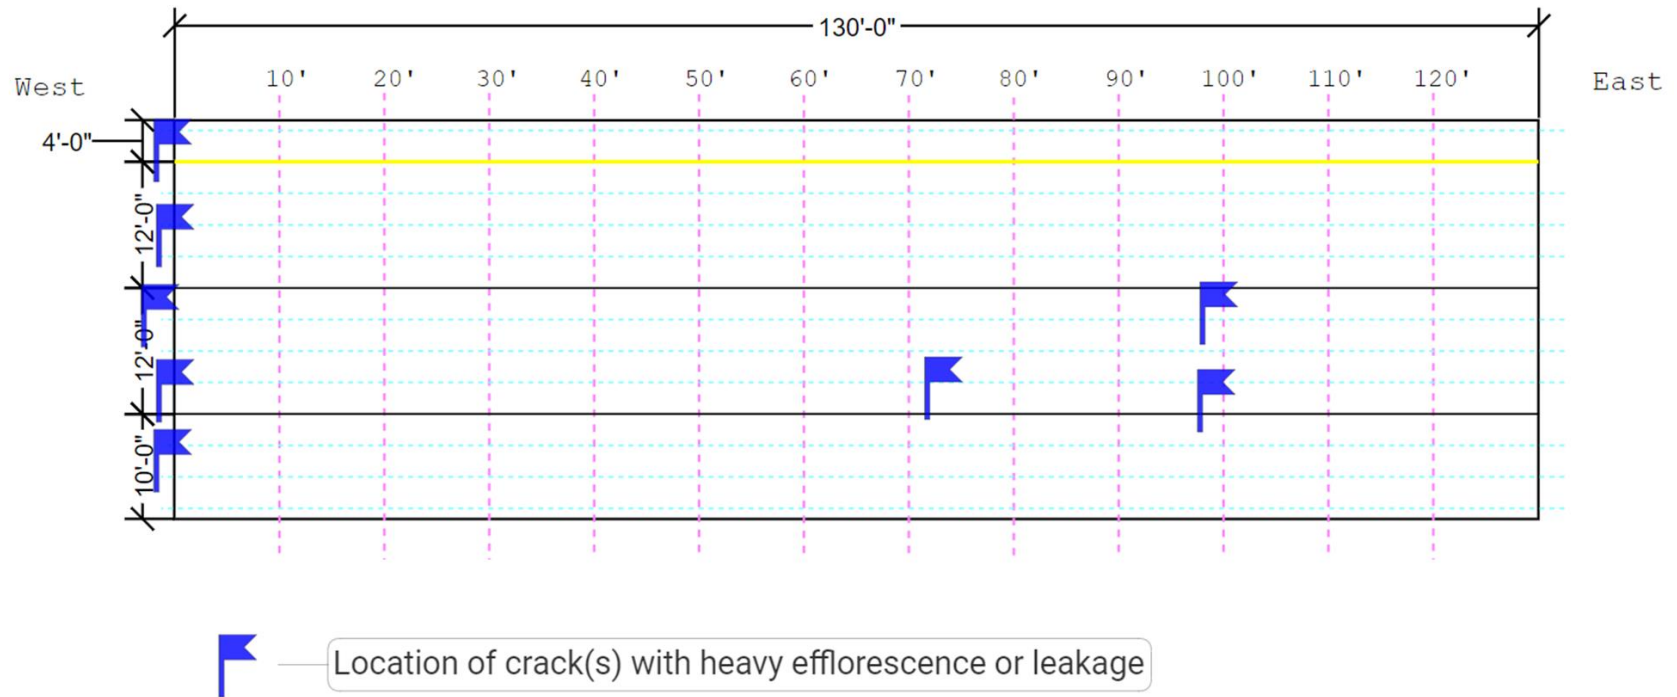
Field notes for Bridge 1374, 2022 inspection, soffit.
